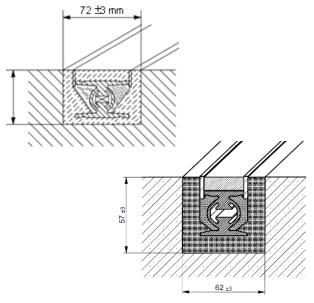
Sensor cross section and slot dimensions (9195G & 9196A)
